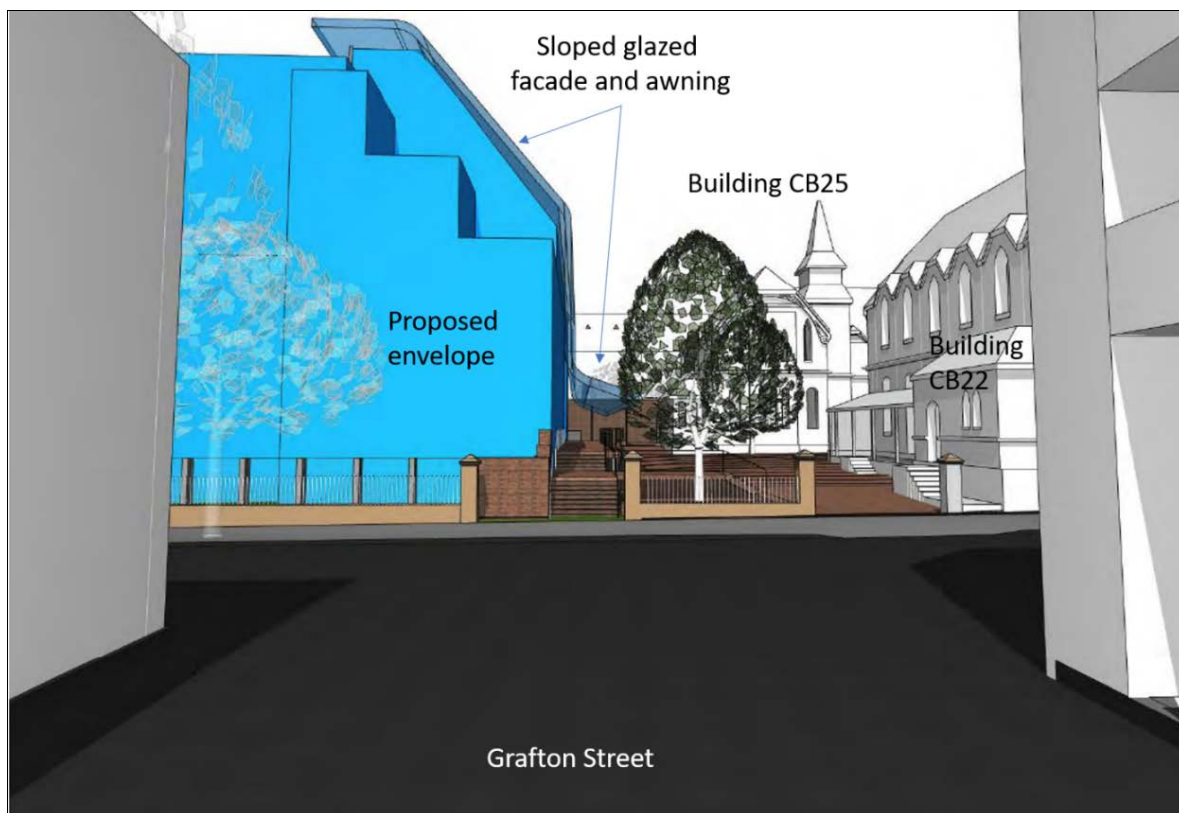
| 3D view along Grafton Street to the proposal and the northern façade of CB22
